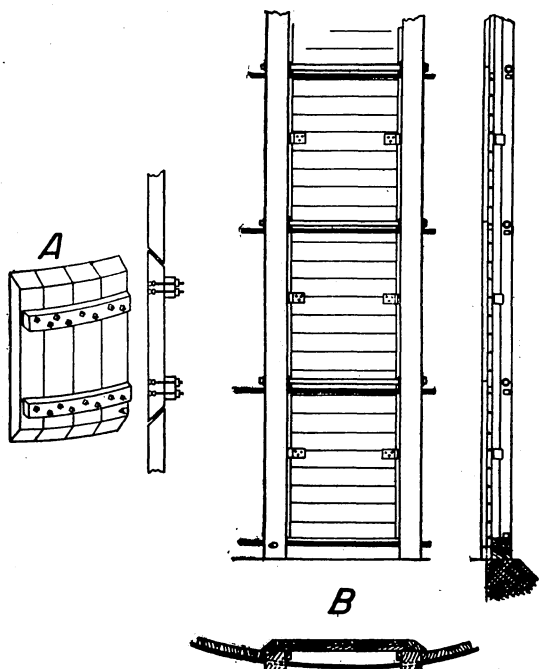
Details showing construction of doors of silo when not made continuous.
